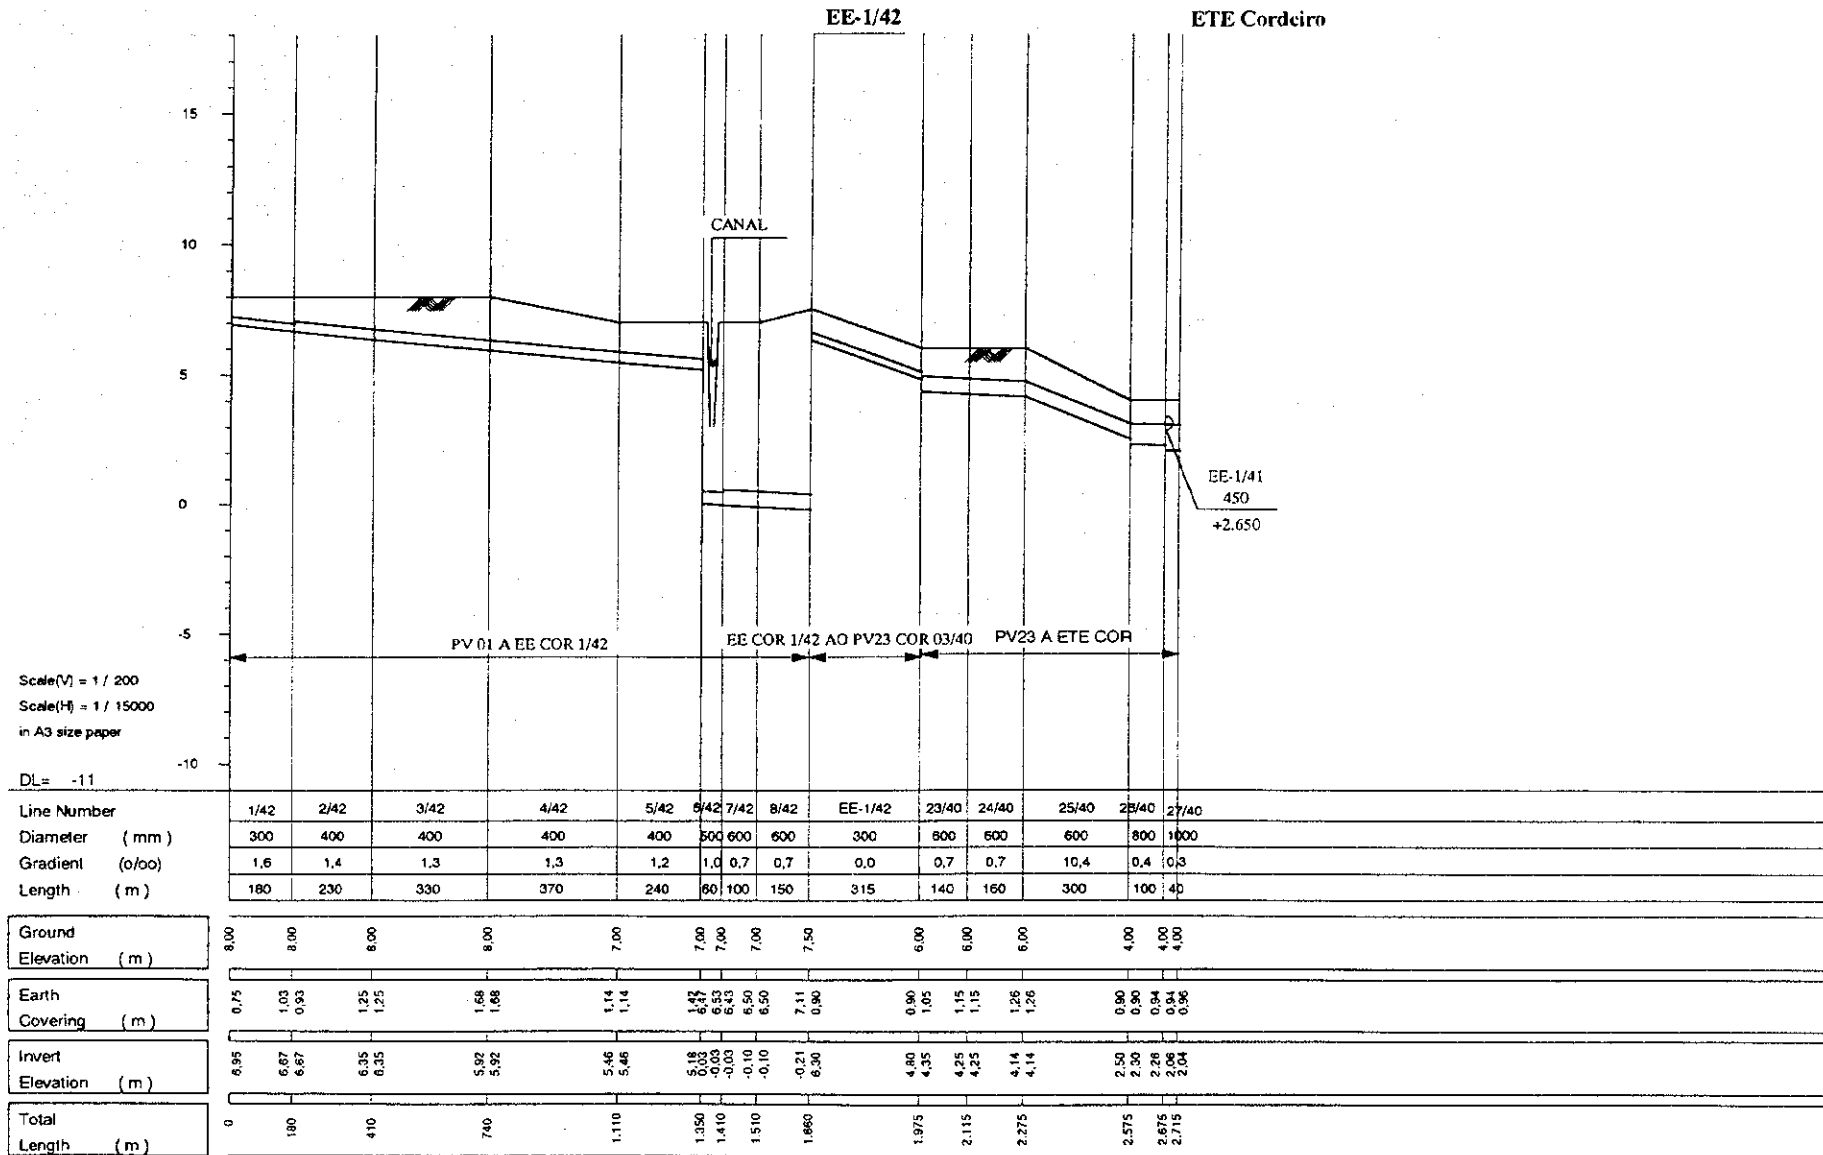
Longitudinal Profile of Proposed Sewer to Cordeiro 1
